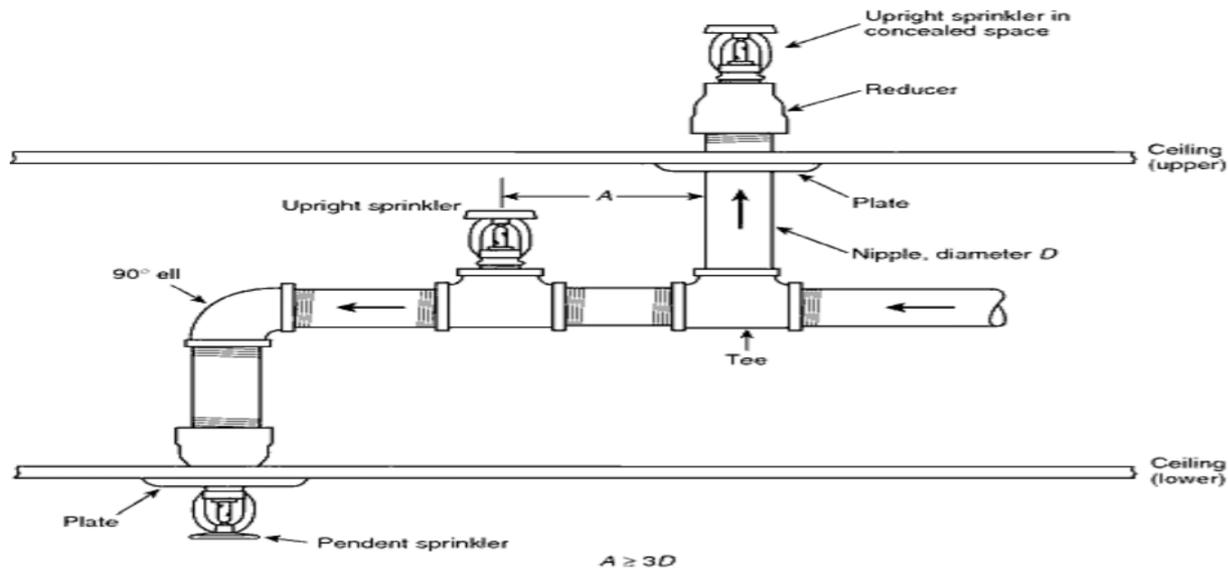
(c) Arrangement of Branch Lines Supplying Sprinklers Above, in Between, and Below Ceilings.
